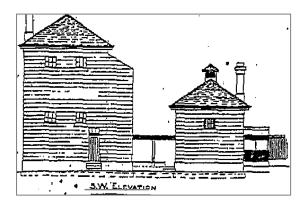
South-west elevation. Hospital (left) and the Bathroom and Morgue (right)
